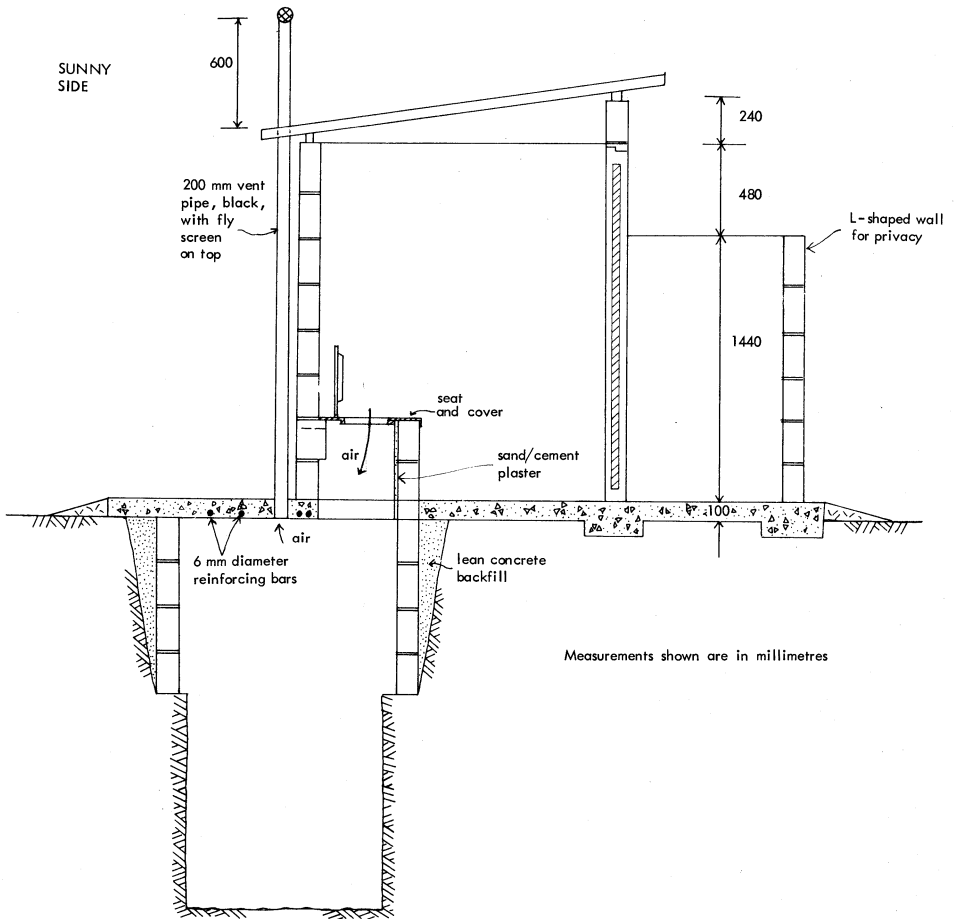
Supported pit latrine with ventilation. (From a drawing by R. A. Boydell).
